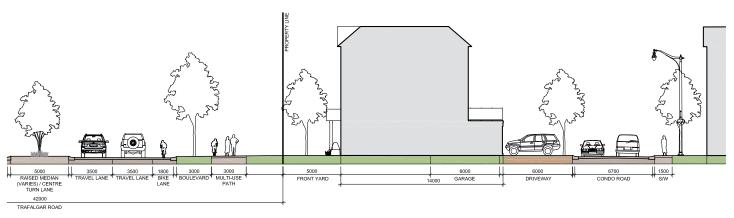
Conceptual section of Trafalgar Road interface with rear garage townhomes
